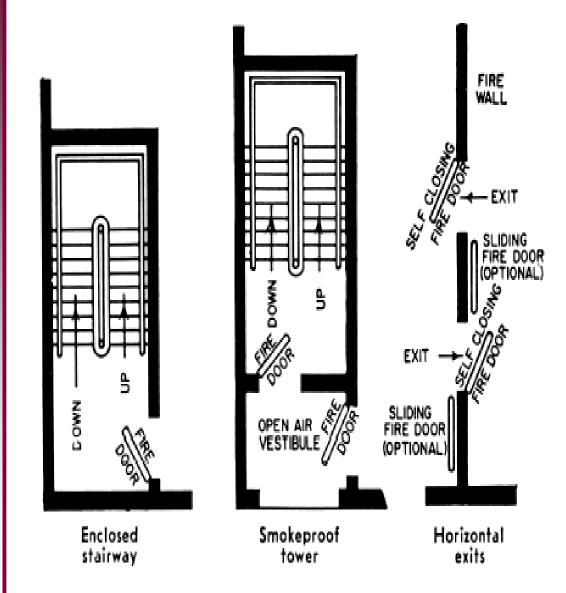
Plan views of types of exits. Stair enclosure prevents fire on any floor from trapping persons above. A smokeproof tower is better because an opening to the air at each floor largely prevents the chance of smoke on the stairway. A smokeproof tower charged with positive air pressure is more likely to prevent smoke from entering. A horizontal exit provides a quick refuge and decreases the need for a hasty flight down stairs. Horizontal sliding fire doors provided for safeguarding property values are arranged to close automatically in case of fire. Swinging doors are self-closing. Two wall openings are needed for exit in two directions. (Reprinted with permission from the National Fire Protection Association.)
